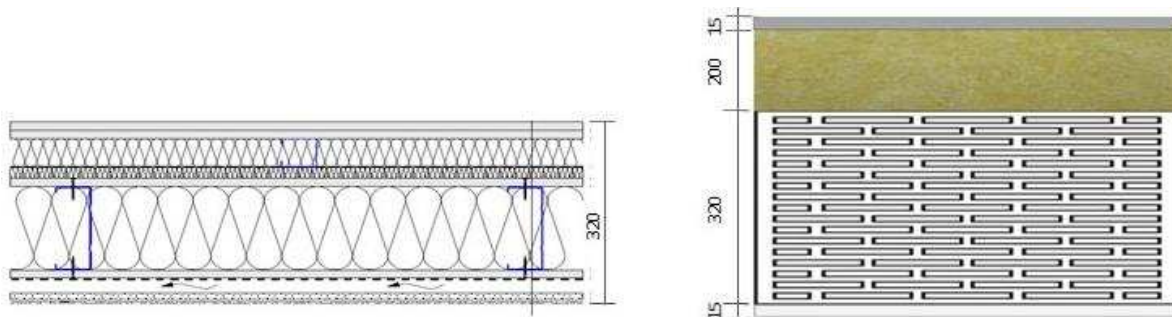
Traditional masonry building wall, considered in comparison to the ELISSA wall.
